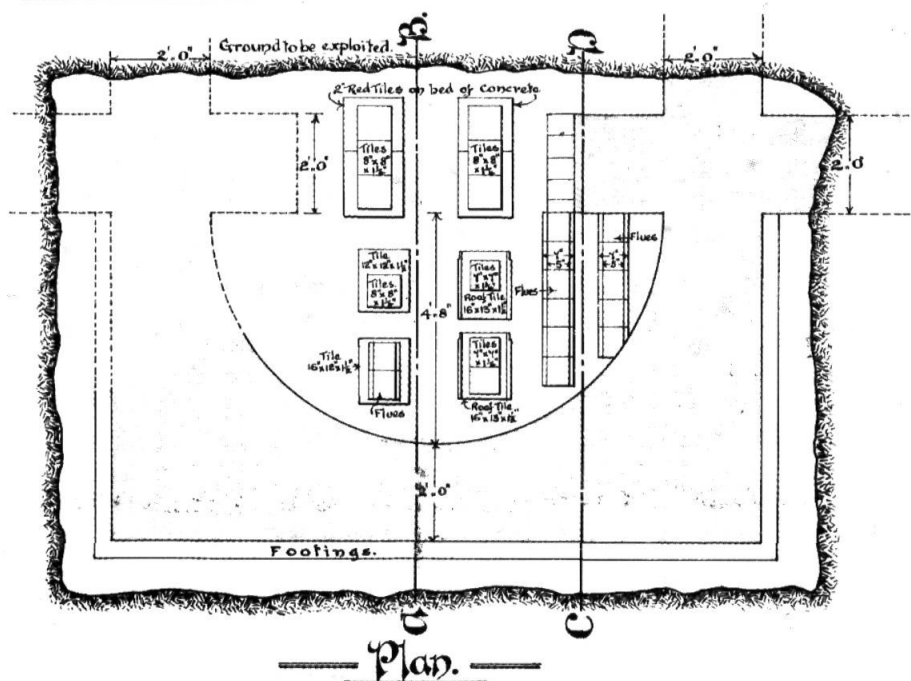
Langstone Avenue: Owen Adames' detailed plan and section of the plunge bath
